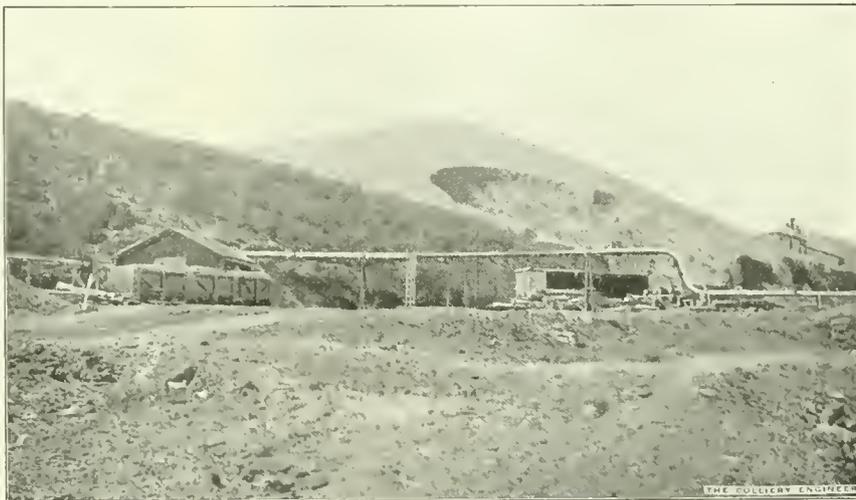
CULM PILE BEING FLUSHED INTO HOLMES SEAM WORKINGS AT TUNNEL RIDGE COLLIERY
